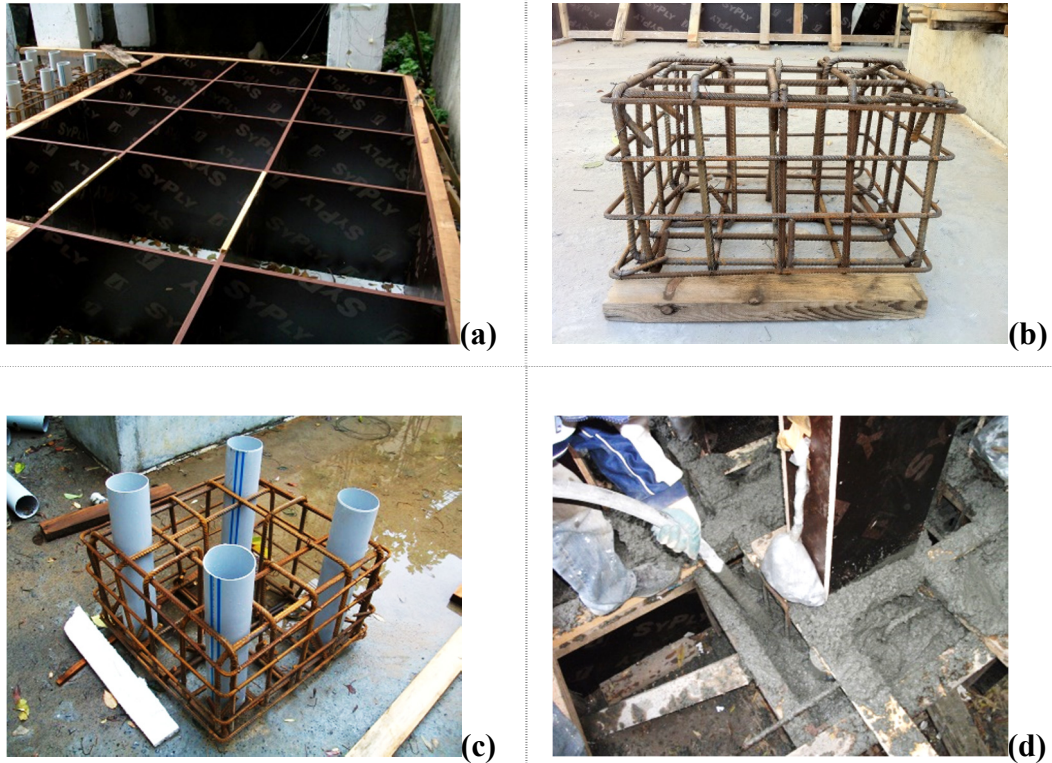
Construction of footings: (a)Formwork. (b)Reinforcement cage. (c)PVC pipe installment. (d)Vibration during concreting.
